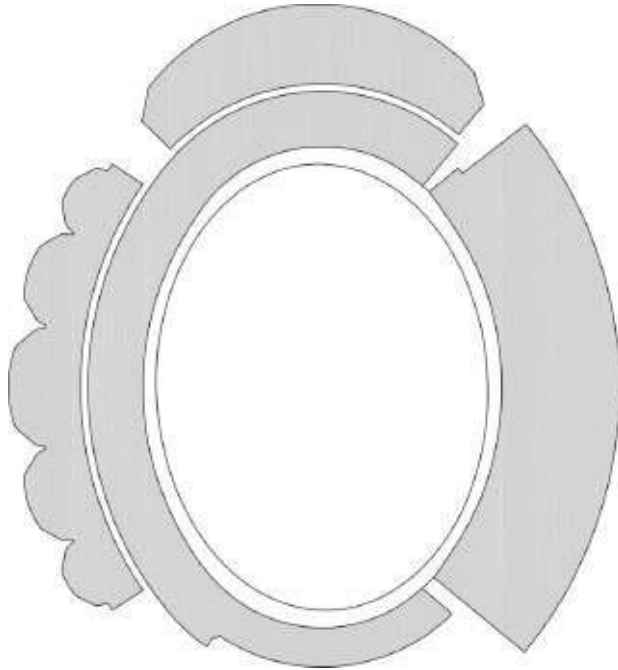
Plan view of a cricket or Australian football stadium showing an example of a typical seating arrangement.
